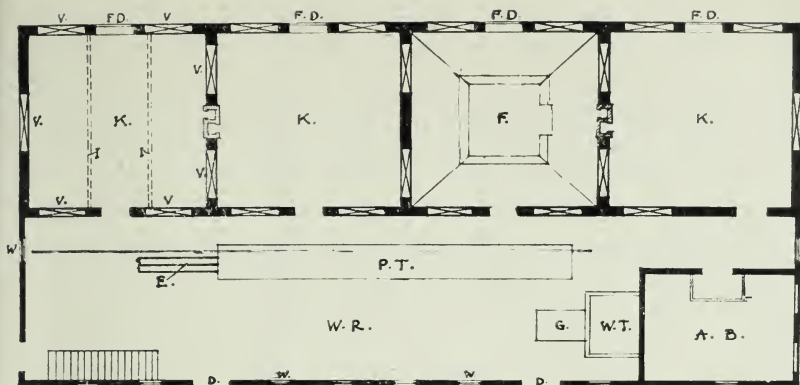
Fig. VI. Four kiln evaporator, ground-floor plan. K.K., kilns, each 20x20 feet. W.R., work room, 80x18 feet. A.B., apple bin, 12x15 feet. W.T., washing tank. G., grader. P.T., paring table. E., conveyors for apples and waste. V., ventilators, 5x1½ feet. F.D., fuel doors to kilns. I., I-beams supporting kiln floors. F., furnace with jacket-and-hopper construction. W., windows. D., doors.
